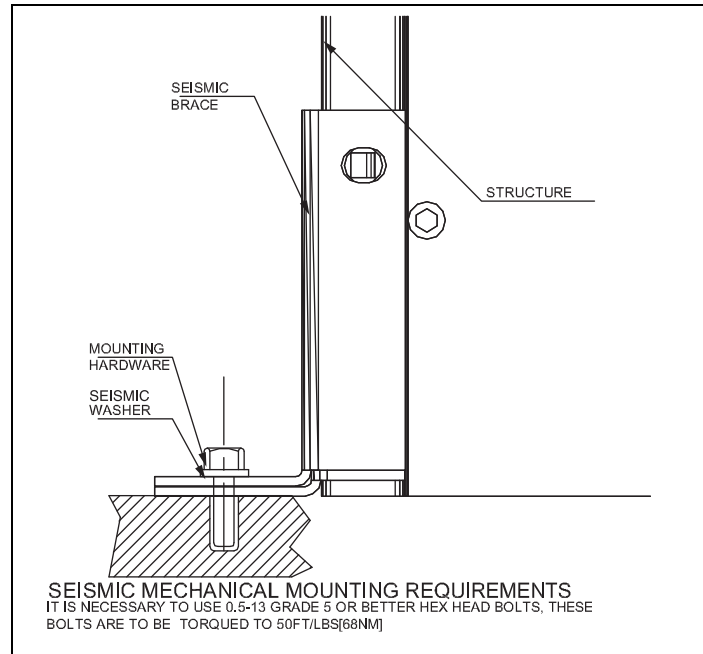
Seismic Tested and Approved Product Mounting Instructions.
